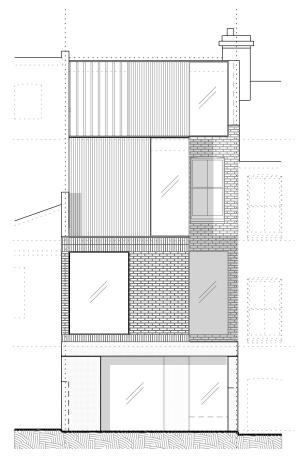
Proposed Rear Elevation indicating side infill, rear canopy extension, first floor extension and dormer roof extension.
